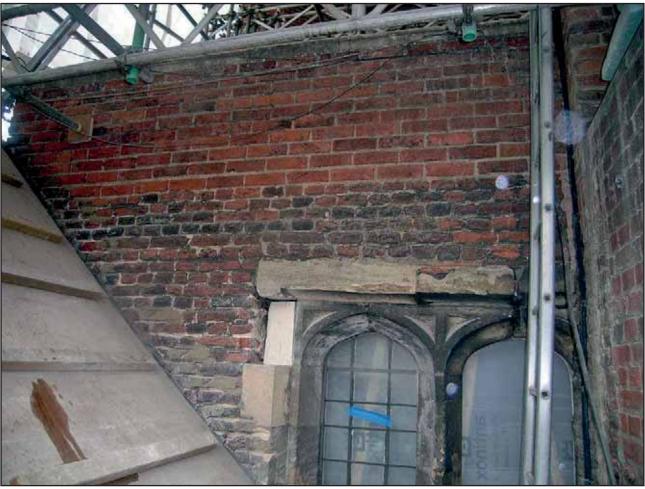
Base Court – West Facing Elevation Part 1, looking north east
